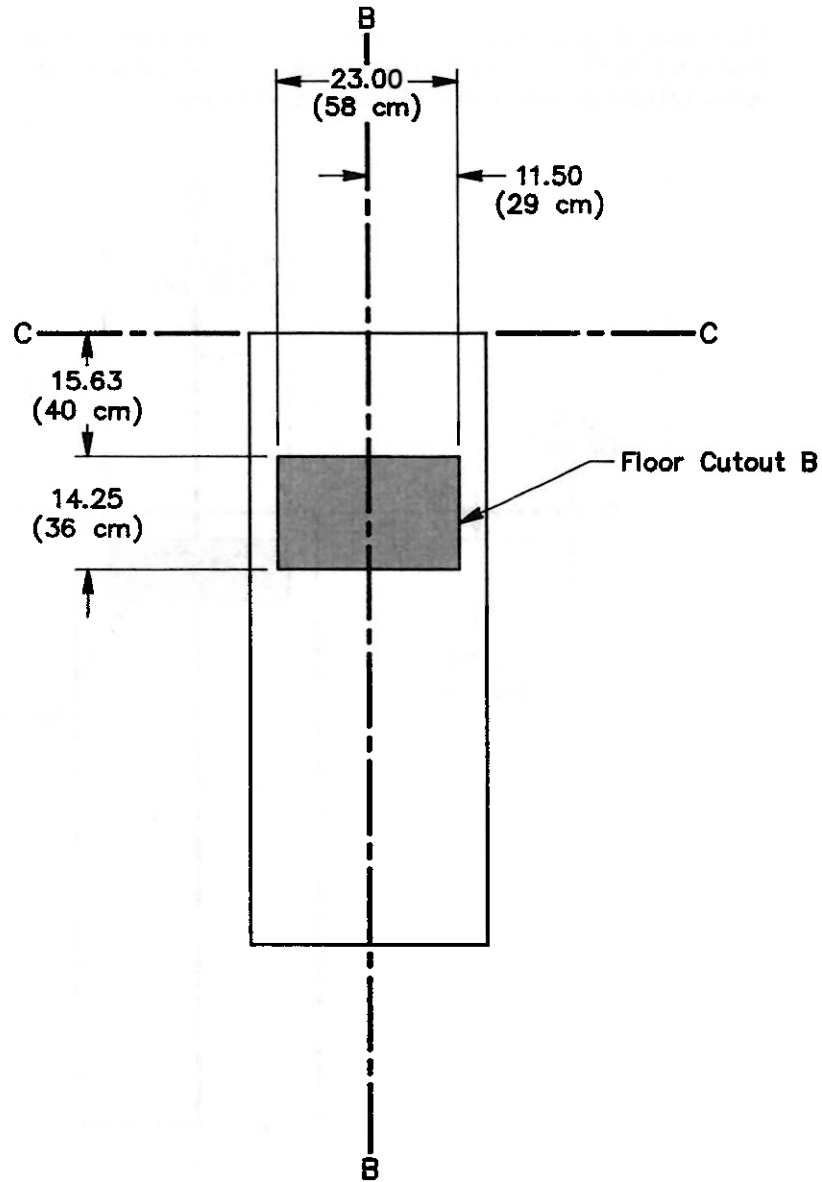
Location and Dimensions of MFC Floor Cutout B
